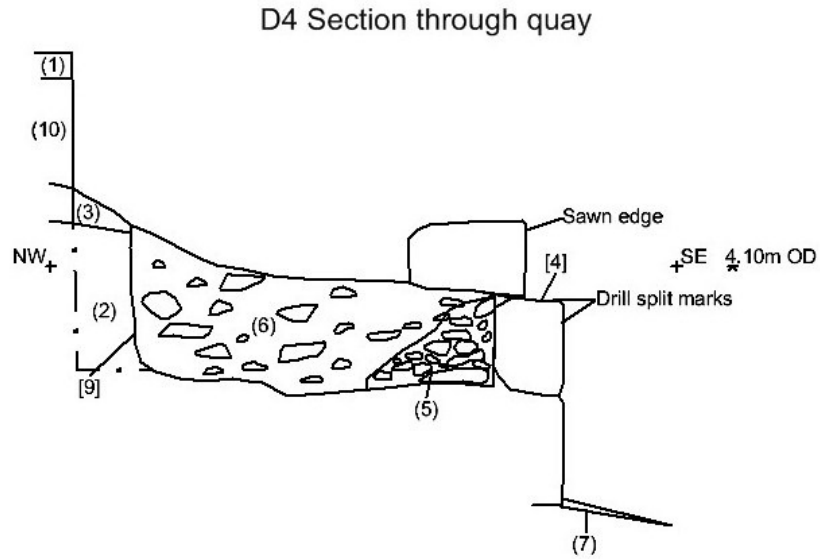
Section drawing through the Upper Quay wall in test-pit 2 as existing
